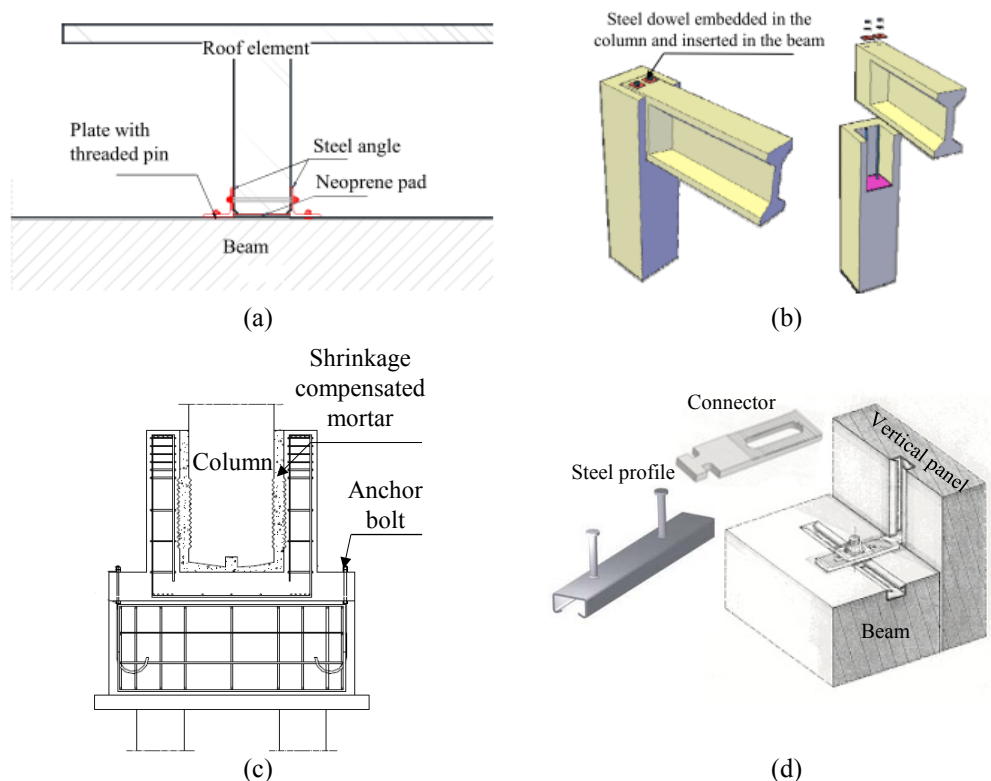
Examples of connections in precast structures: (a) pin roof element-to-beam connection; (b) dowel beam-to-column connection; (c) socket column-to-foundation connection; (d) vertical panel-to-beam connection
